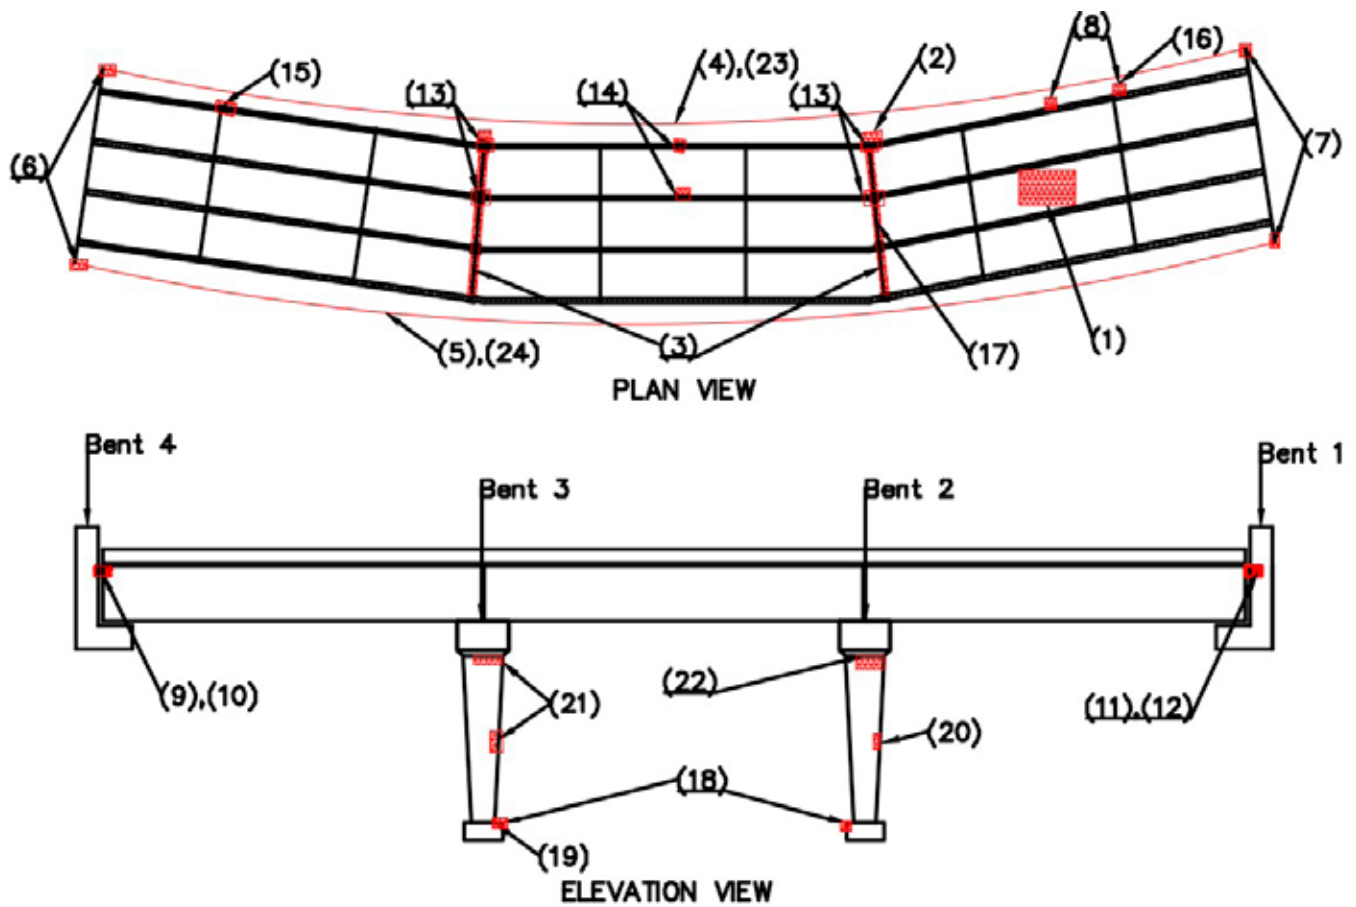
Schematic of damage location on timber girder bridge. (Red rectangles in plan and elevation views indicate damage, and red lines in plan view denote minor cracks along the parapet and rusting in railing in a longitudinal direction. Numbering corresponds to damage summarized in Table 23.)
